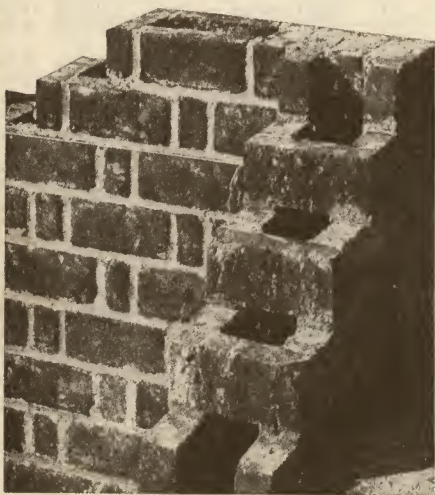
" Ideal all-rolok wall. Note its attractive appearance and sturdy construction.
